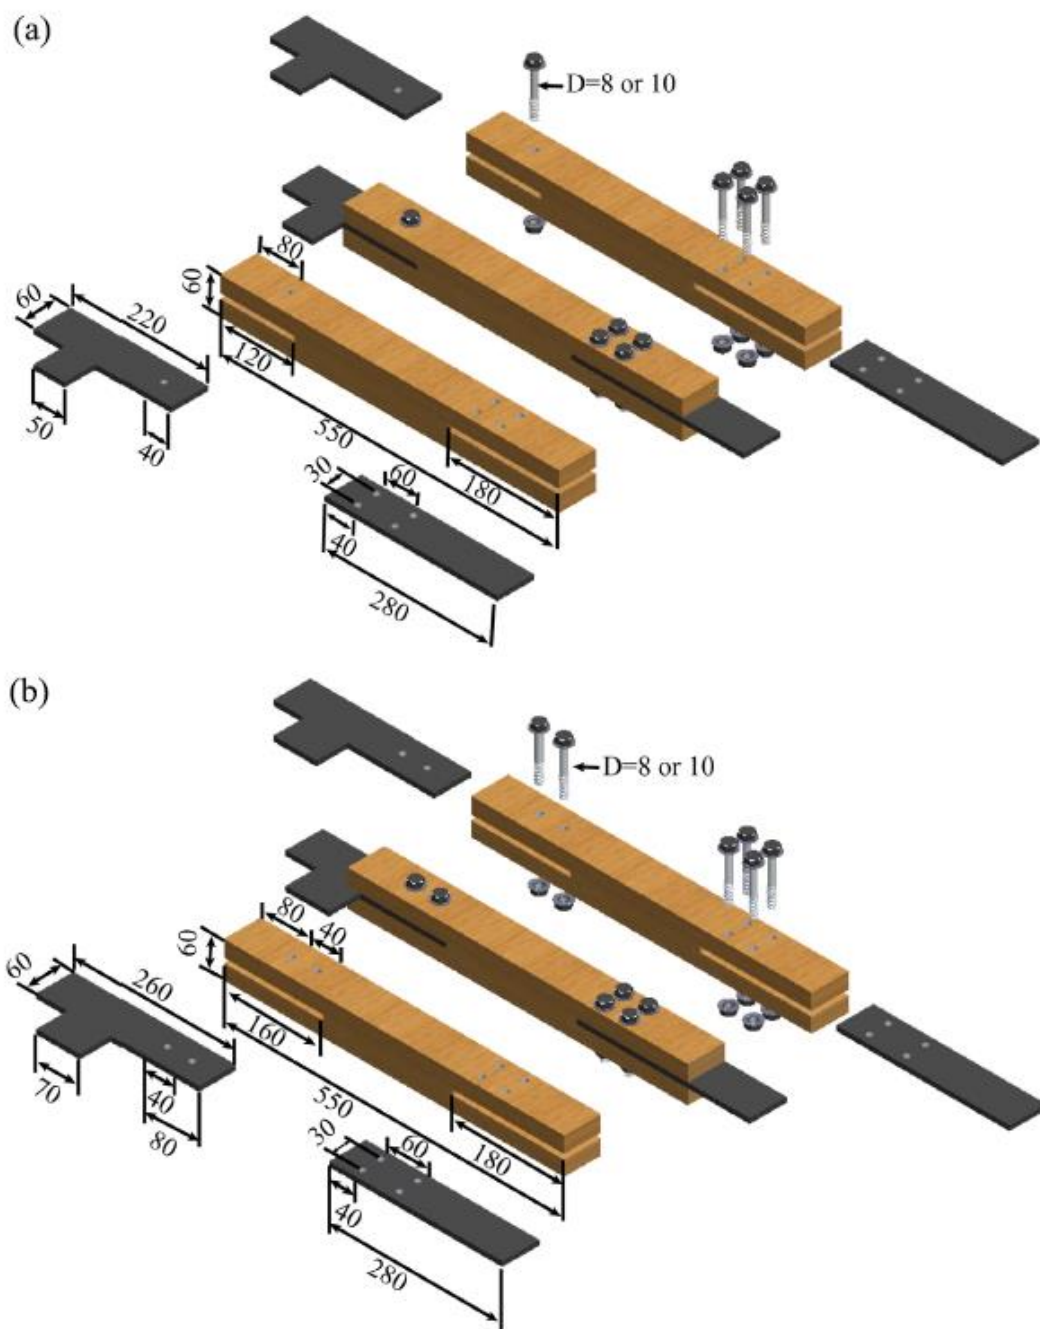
Mechanical Test Specimens for Steel Insert-Plate Glulam Connectors:(a) Single bolt specimen;(b)Double bolt specimen
